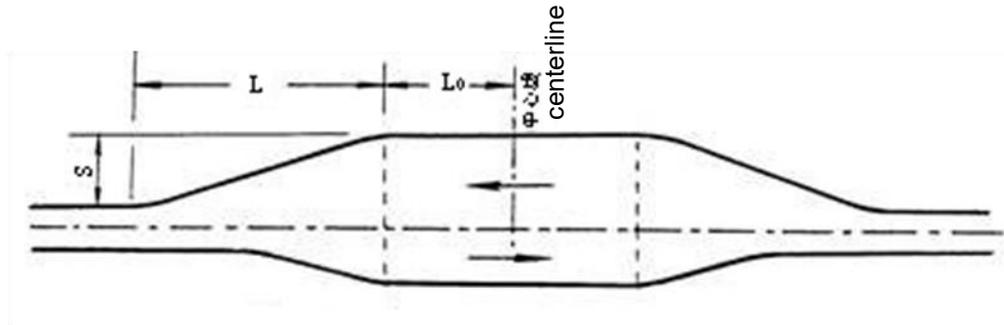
Layout of Toll Plaza with Transition Sections
